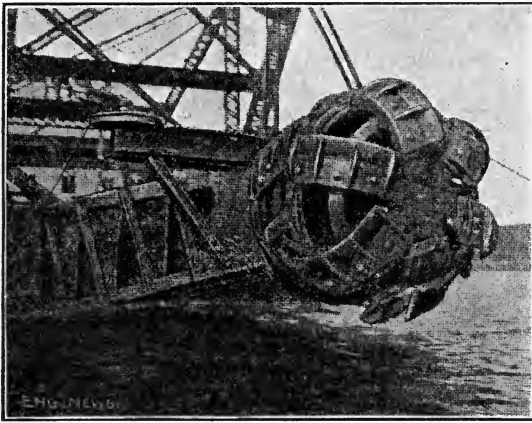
Rotary Cutter at the End of Suction Pipe.
